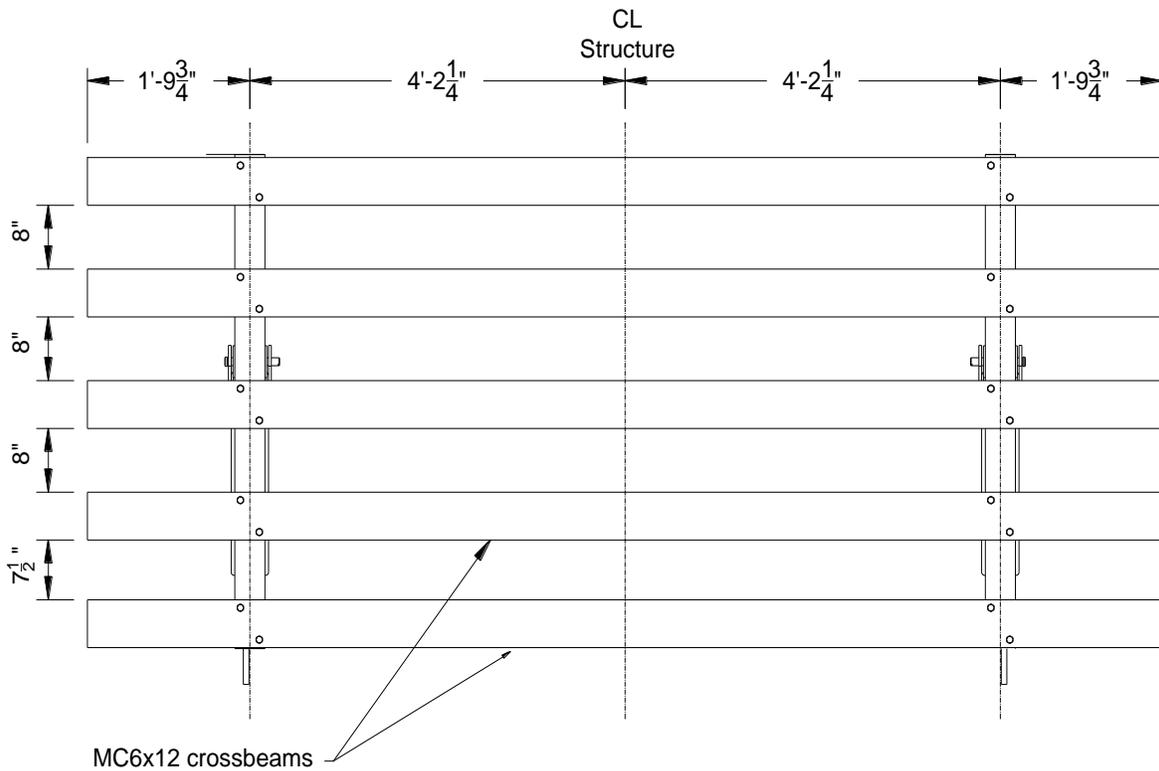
Snow supporting structure viewed downhill and normal to grate for the case of ground anchor foundations.
